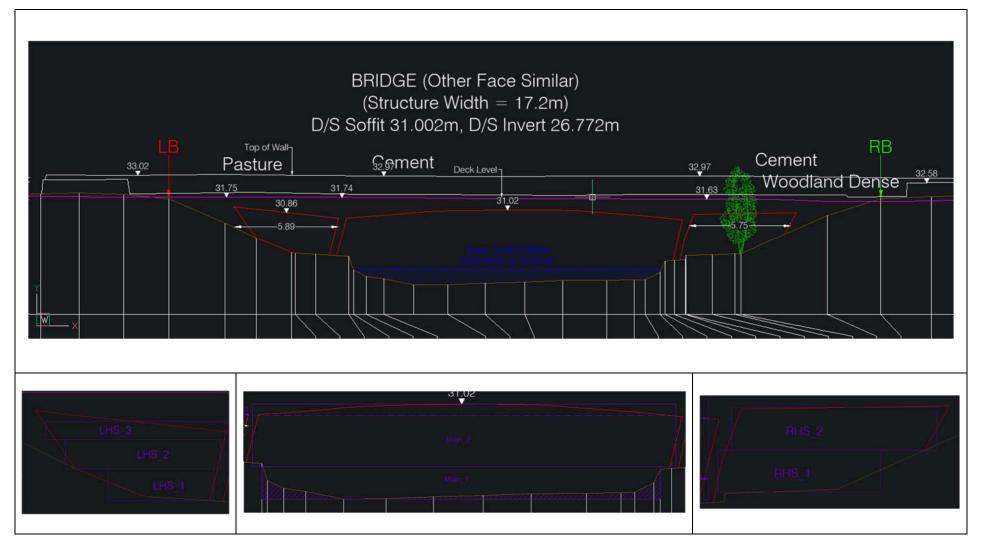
Survey Drawing of Orwell Bridge with Modular Units Displayed
